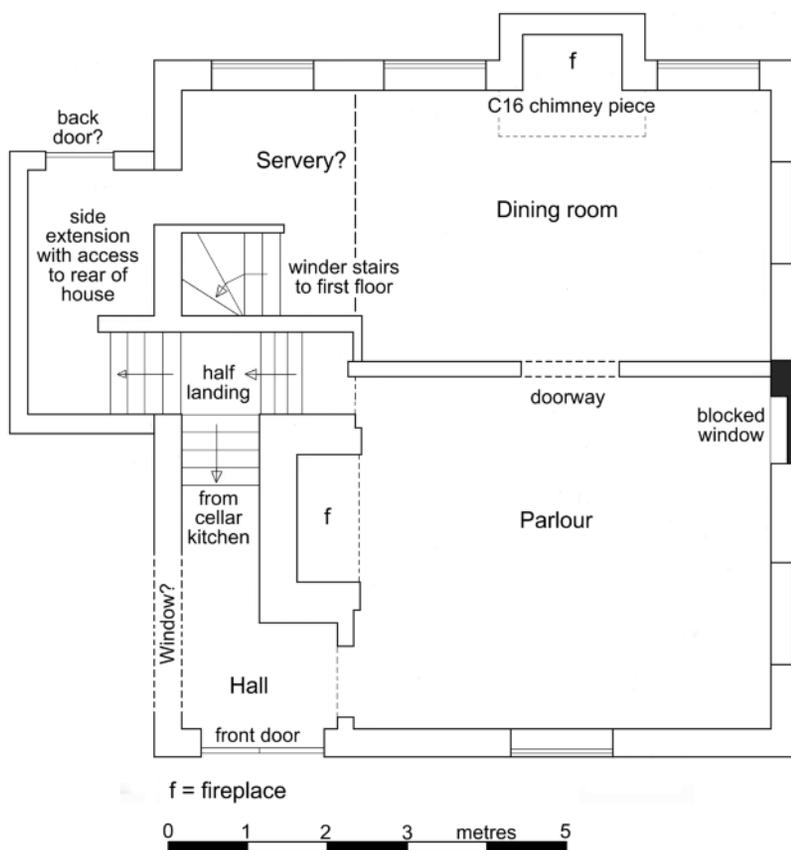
The ground-floor plan of Shell House after the puzzling removal of the dividing wall between Parlour and Dining Room 2ft to the west, impeding both a window (right) and cupboard (left)
